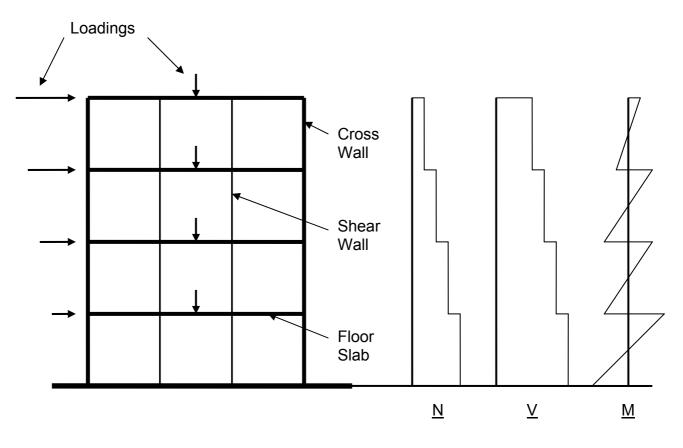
Loads acting on the shear walls with a rectangular cross section – boundary conditions of the wall to the floor slabs with internal forces - schematic diagram
